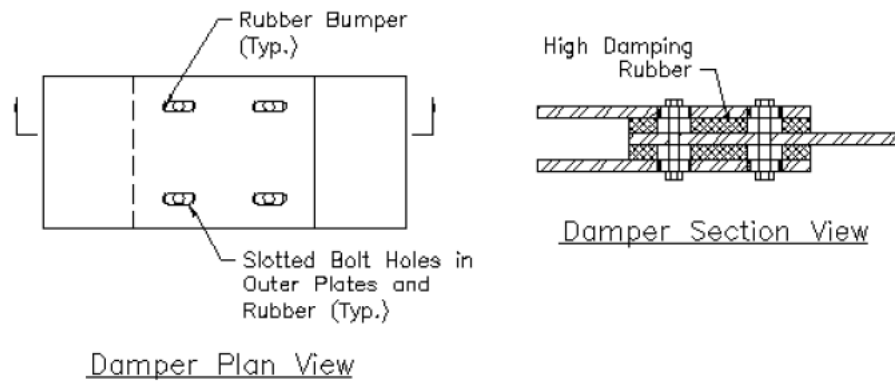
High-damping Rubber Sandwich Damper Schematic (Marshall, 2008)
